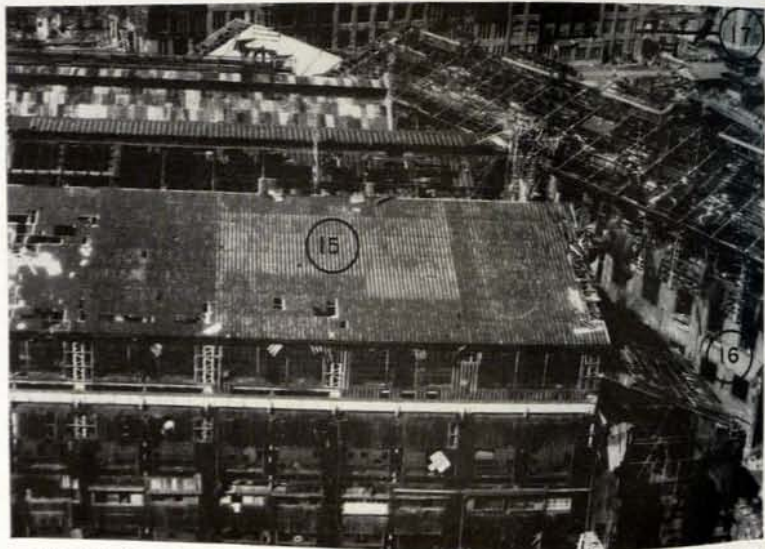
Group 52. Aerial view looking northwest. Parts of Buildings 15, 16 and 17 are visible.
